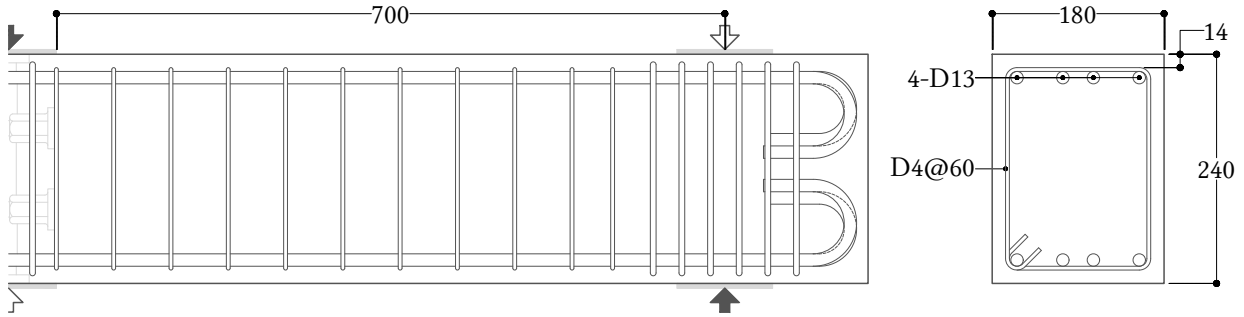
SB01 reinforcement details (all dimensions are in mm)
